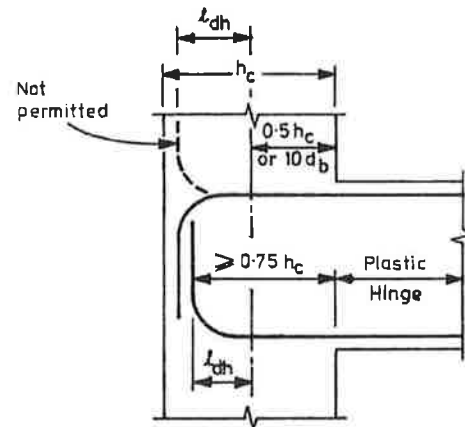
ANCHORAGE OF BEAM BARS WHEN THE CRITICAL SECTION OF THE PLASTIC HINGE FORMS AT THE COLUMN FACE
